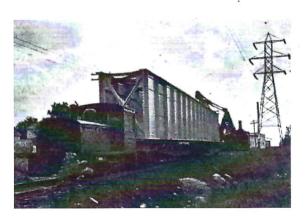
Pre-assembled 100 foot, aluminum, deck plategirder span being transported. Photo from Railway Age. ¹³
